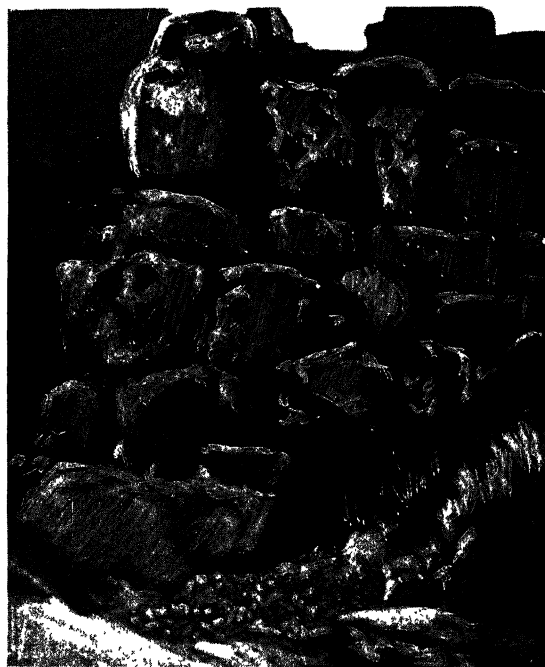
SUPPORTING WALL OF ROAD BY BRIDGE-HEAD, MYCENAE.
